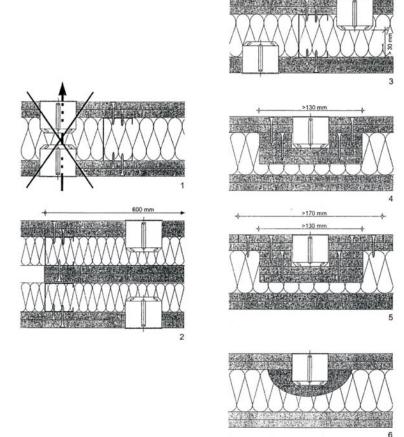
Installation rules for electrical installation outlets in a wall with fire protection requirements
